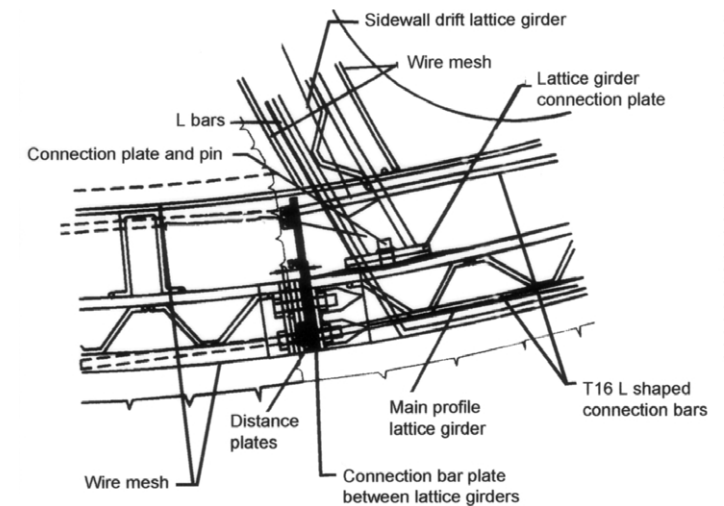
Sidewall drift method. Connection of temporary sidewall to main lining is typically heavily reinforced (as indicated in sketch). This joint requires good sprayed concrete compaction to ensure stability of lining after full profile constructed.
